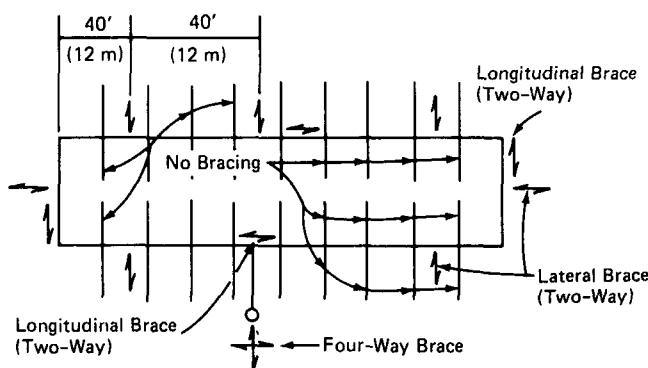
(d) Typical location of bracing on a looped system.
